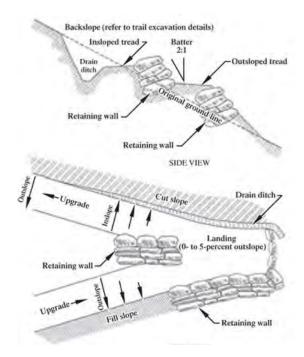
SWITCHBACK WITH RETAINING WALL AND Y-SHAPED PLATFORM, Source: www. fs.fed.us/t-d/pubs/htmlpubs/htm07232806/page12.htm
